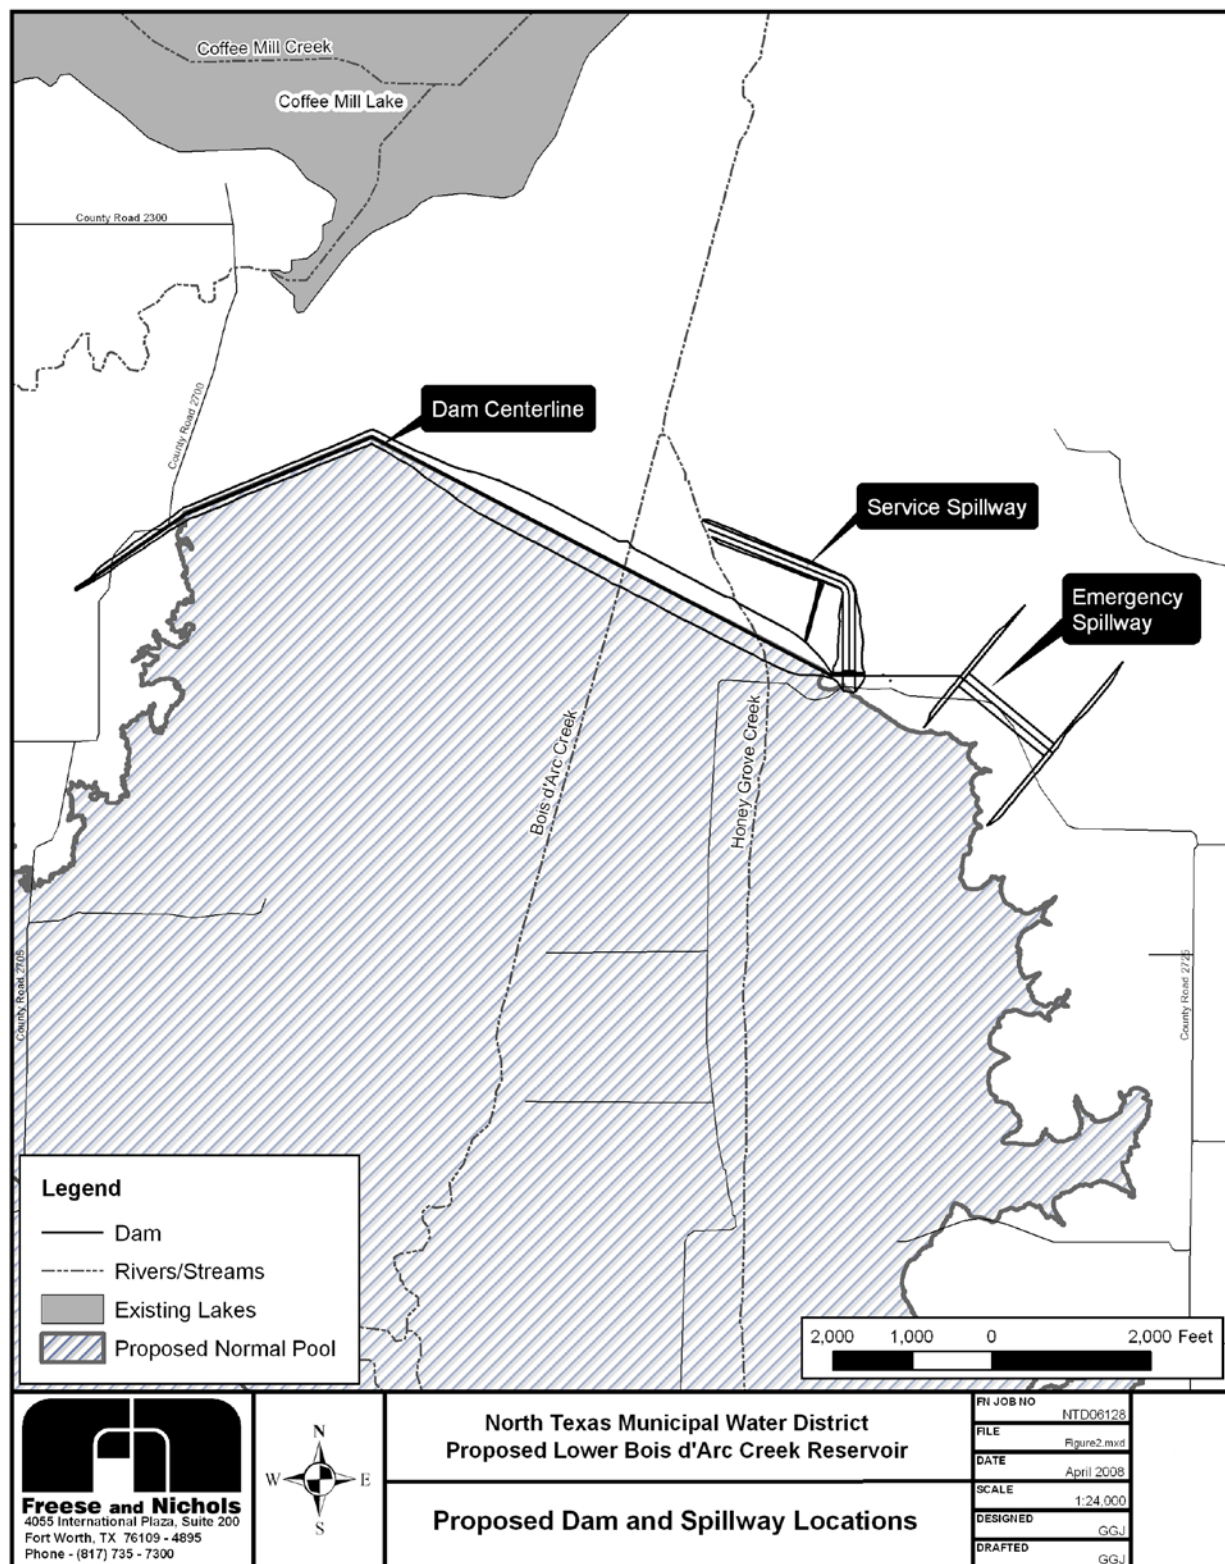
Proposed Lower Bois d'Arc Creek Reservoir – dam and spillway locations
